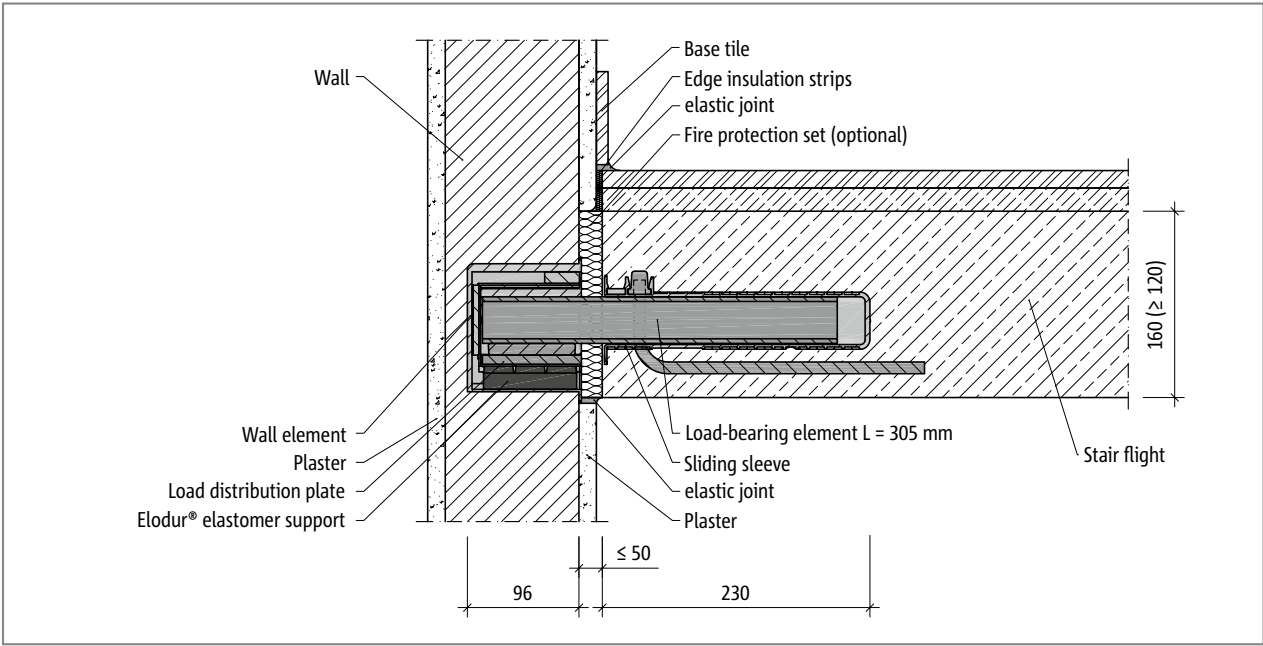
Schöck Tronsole® type Q-FV or Q-A2: Installation cross-section wall thickness 11.5 cm
